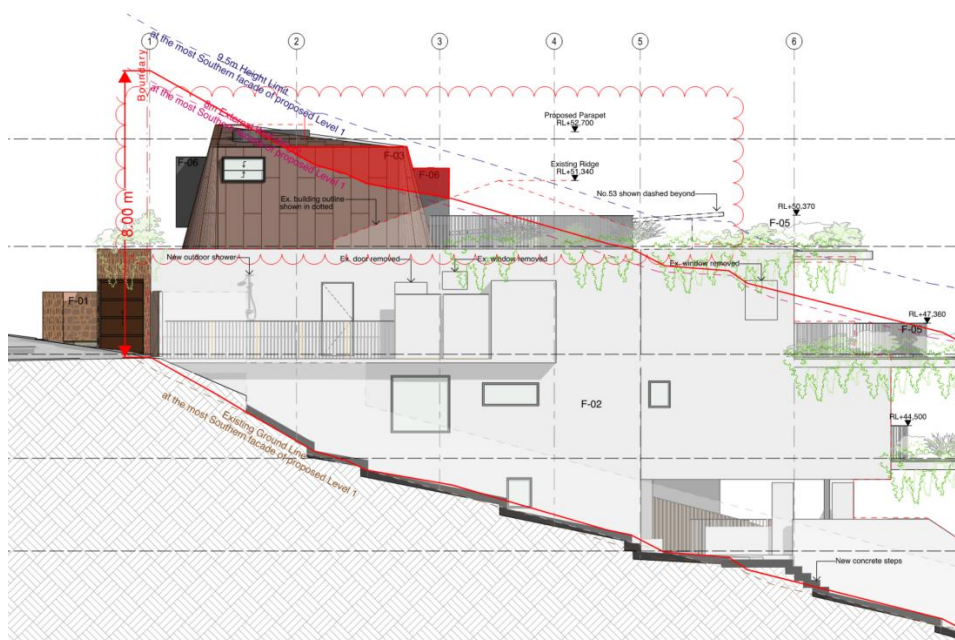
Extent of external wall height non-compliance – Southern Elevation
